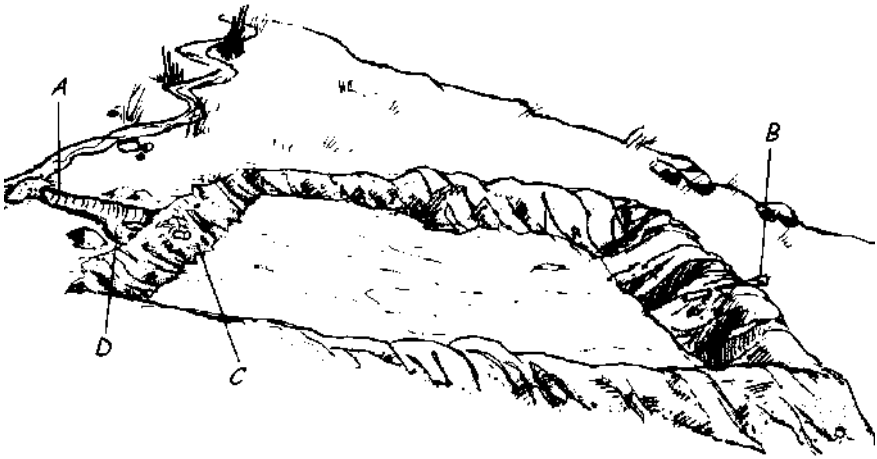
The water inlet and outlet of a pond (Murnyak and Murnyak, 1990). A: inlet canal; B: overflow pipe; C: inlet pipe; D: silt catchment basin.
